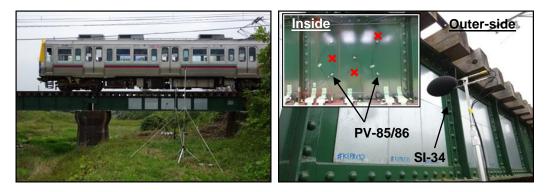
An overview of deck-type plate girder bridge and the arrangement of point excitations (x-mark) and measurement points on/near the girder.
